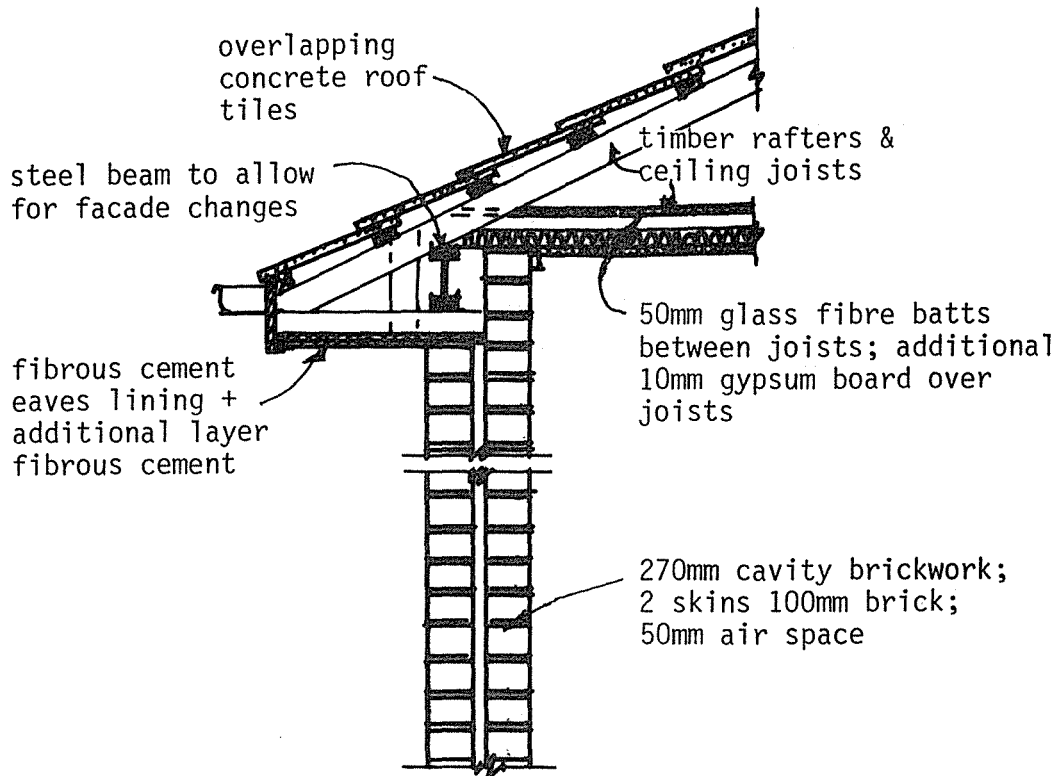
CAVITY BRICK FACADE WITH IMPROVED EAVES/CEILING
